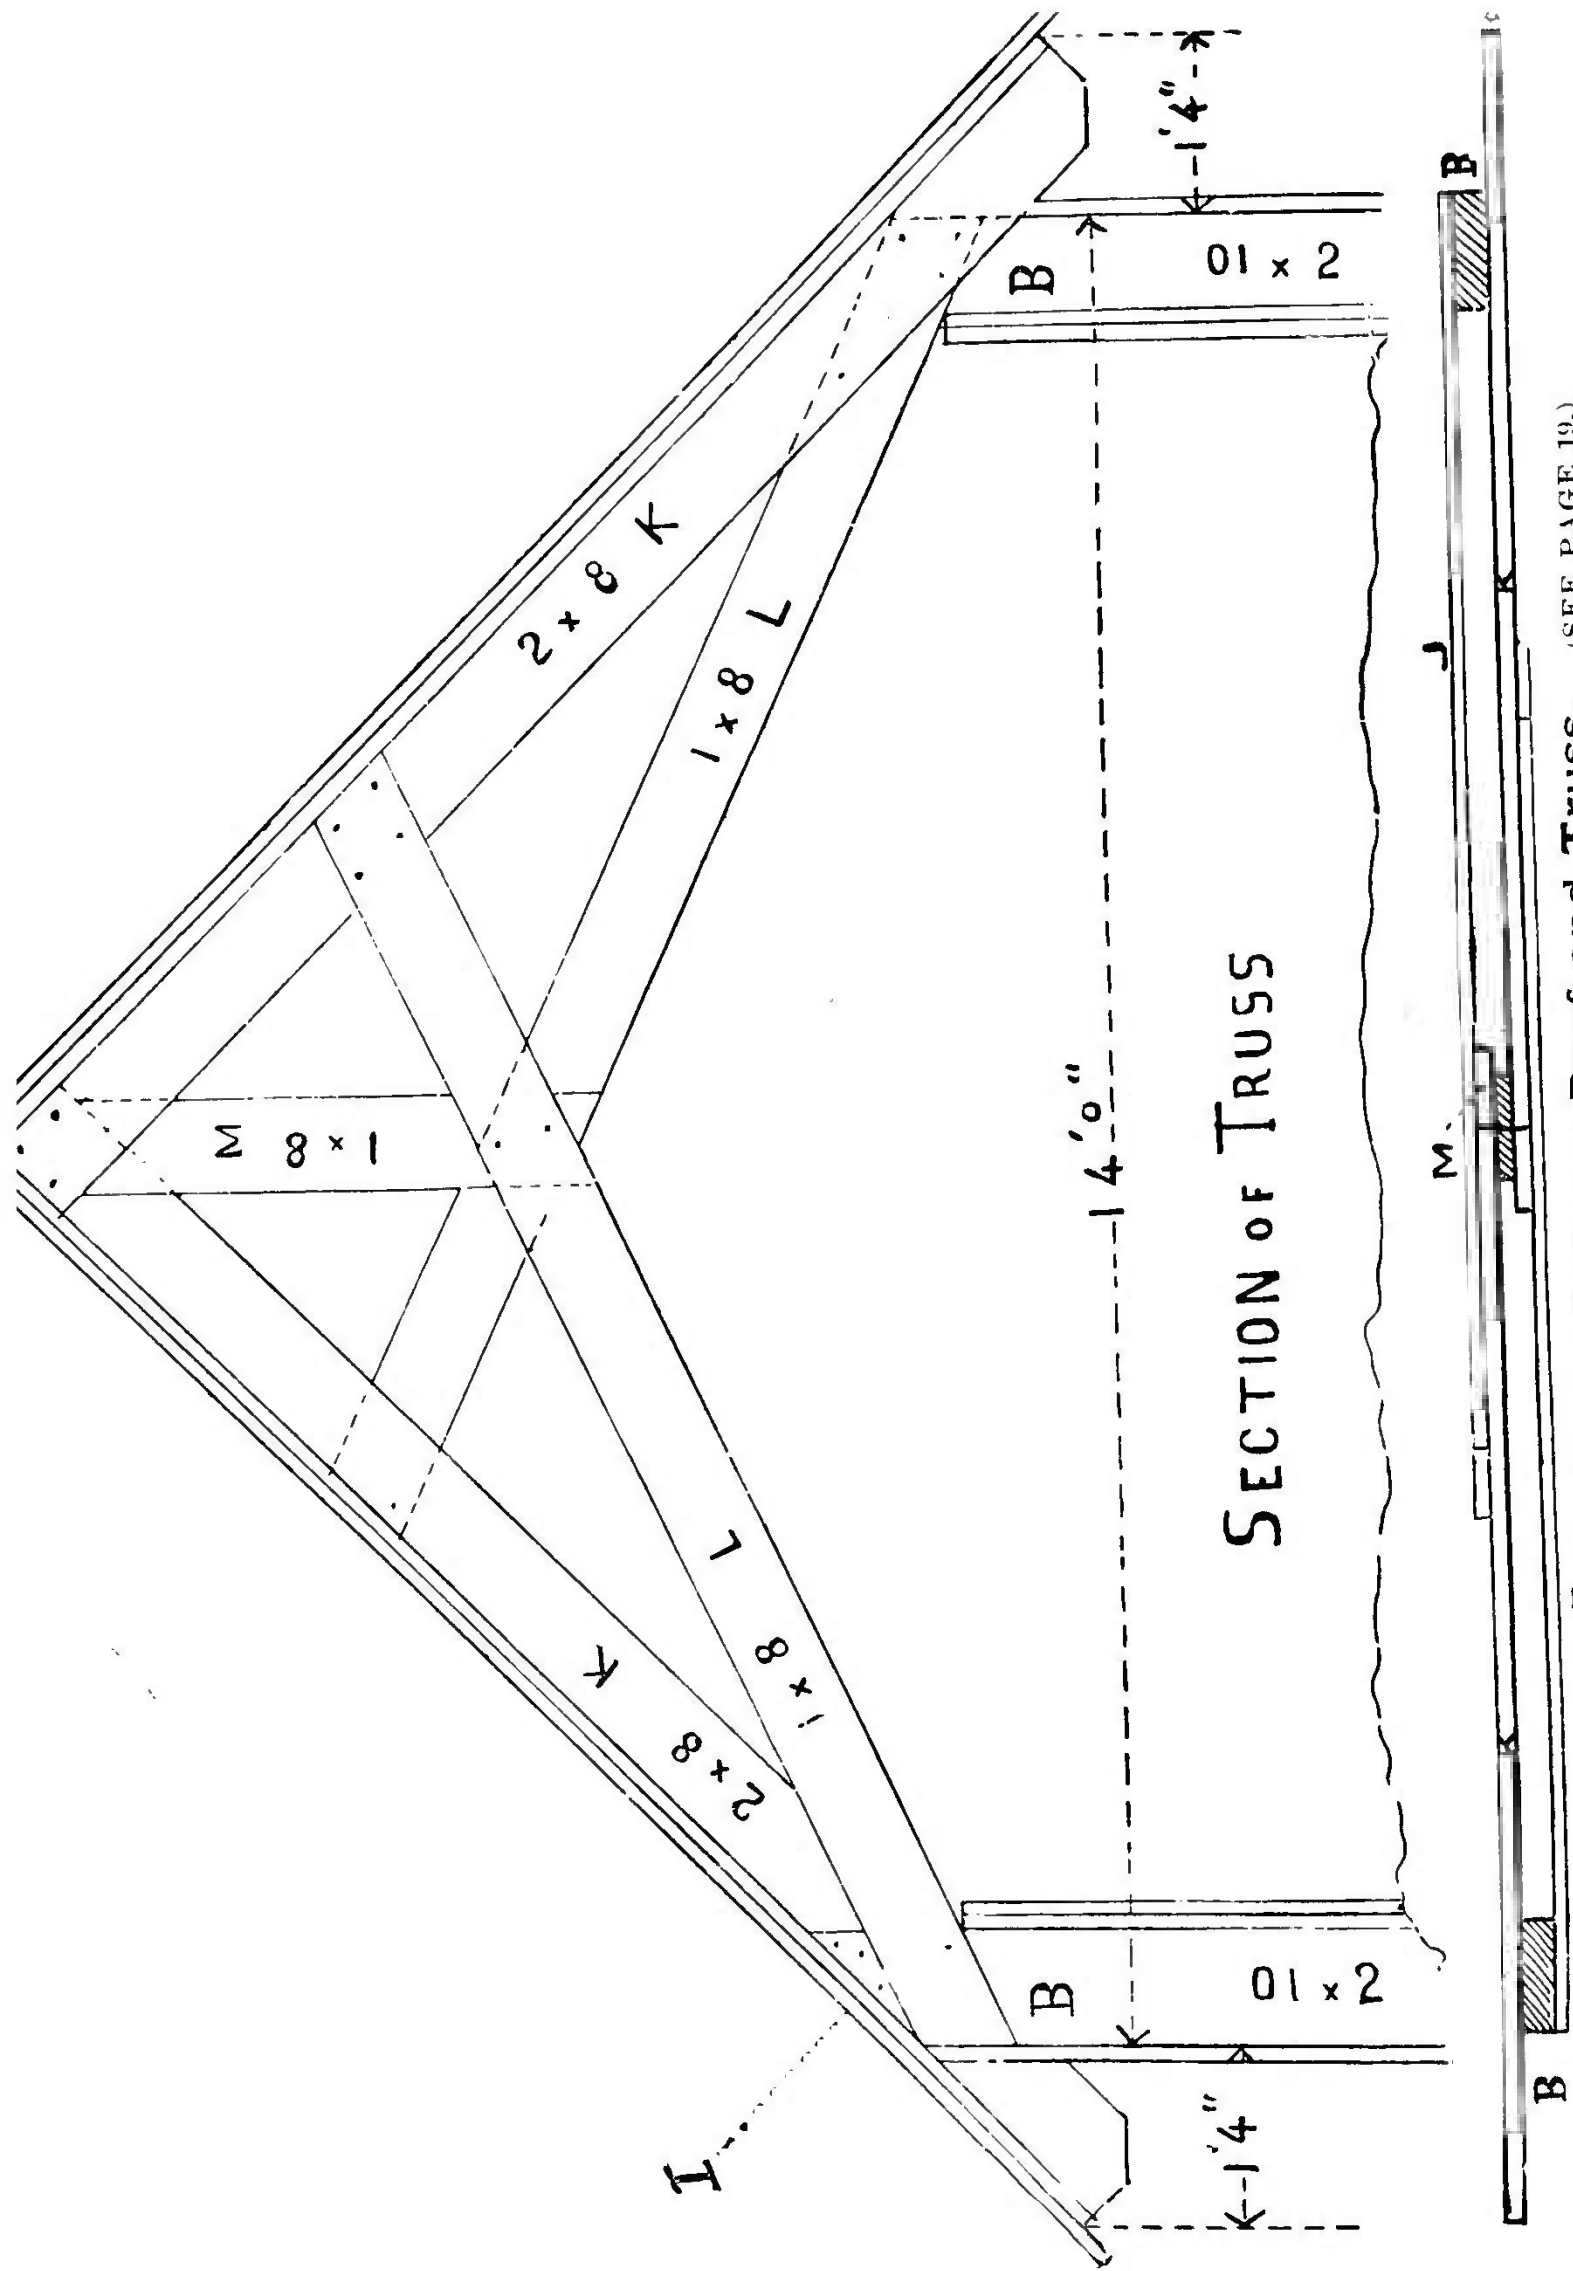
Section of Truss Roof and Truss. (SEE PAGE 19.)
